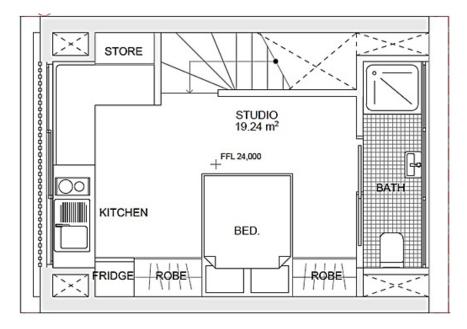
Amended proposal - attic level plan and which is like the attic level plan of the two new two-storey dwellings that were recently approved by the Local Planning Panel under application D/2019/1168 on the adjacent property at 38 Princess Avenue, Rosebery.
